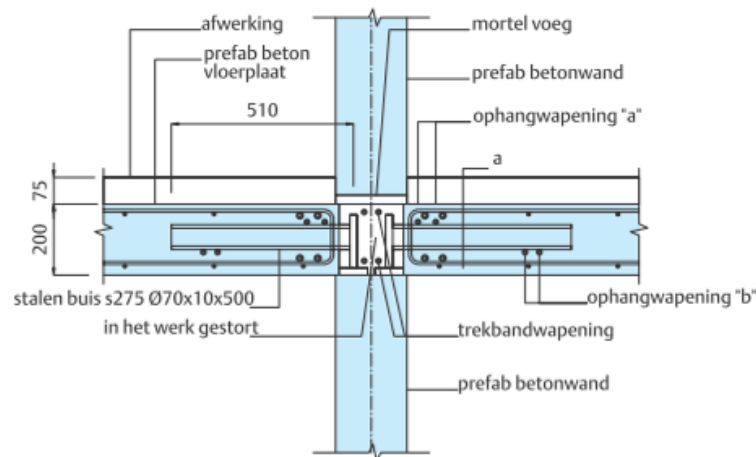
Floor support Waterstadstoren [Alphen 2005]
